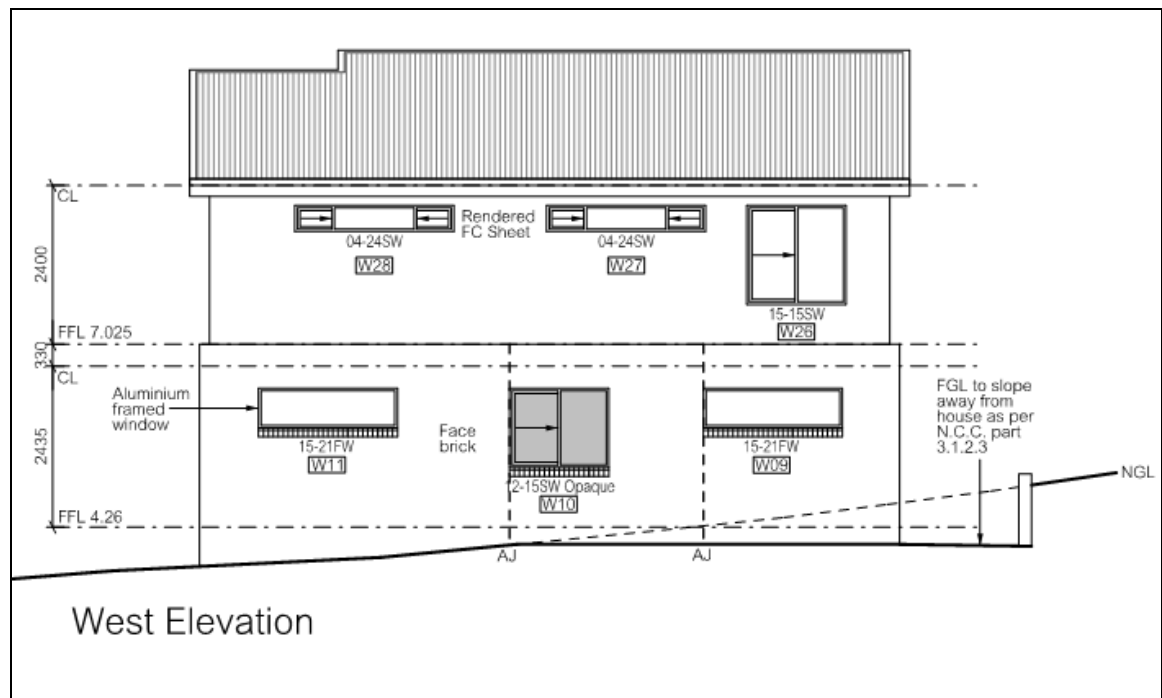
Western elevation from Elevations Plan o3/o3 (Rev F) as submitted 5 April 2016.
